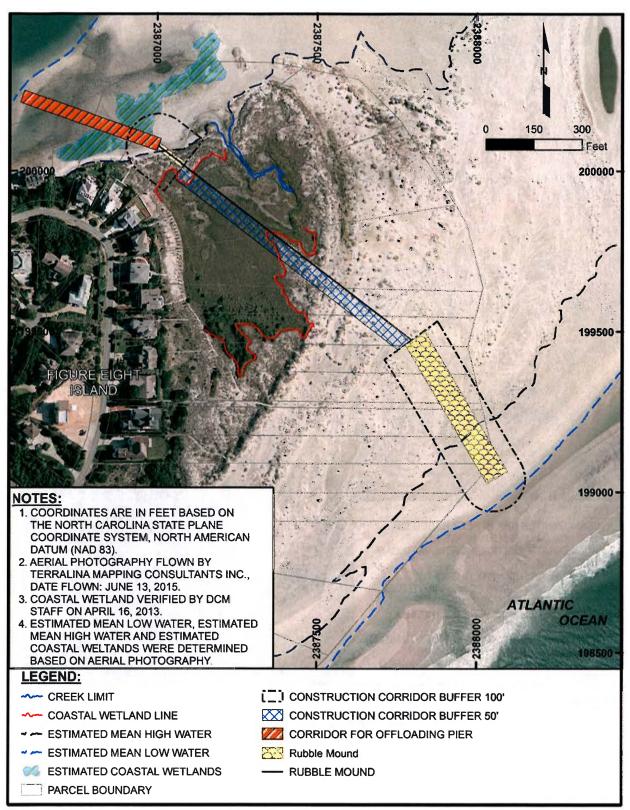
Centerline of the terminal groin, construction corridor, and offloading pier.
